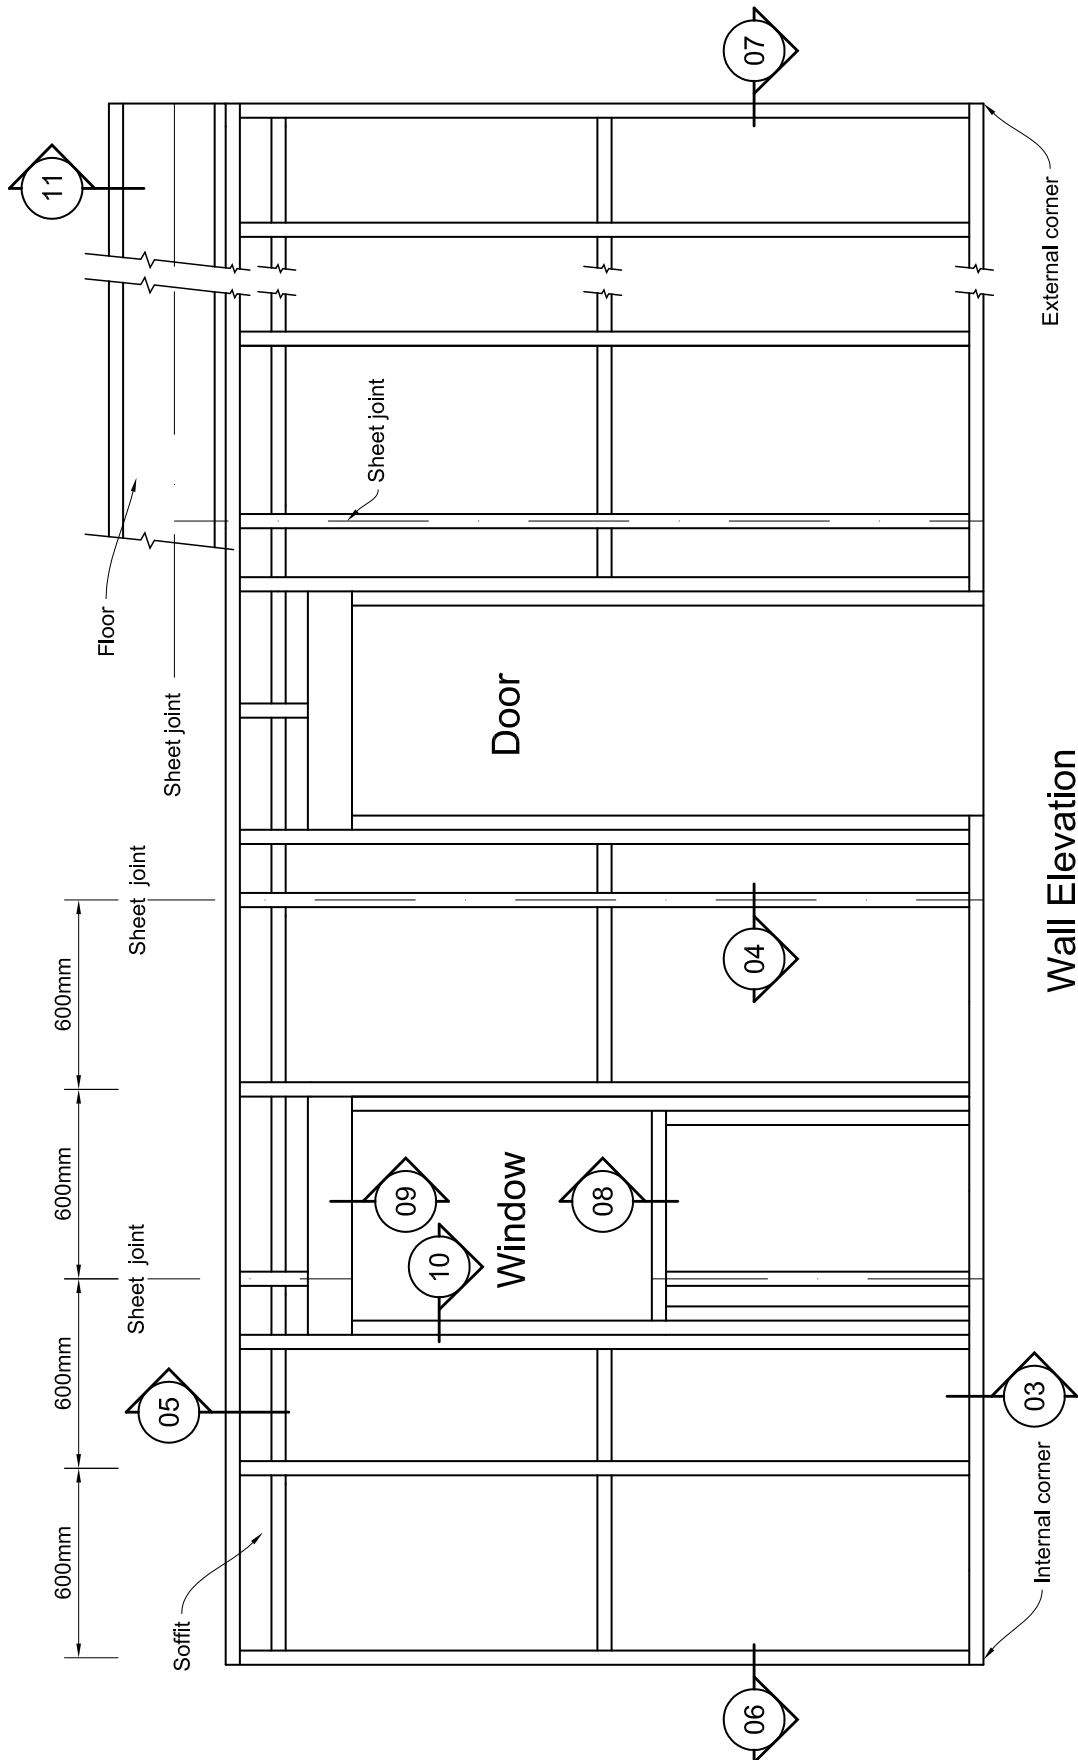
Direct fixed typical panel HardieFlex nail fixing setout
